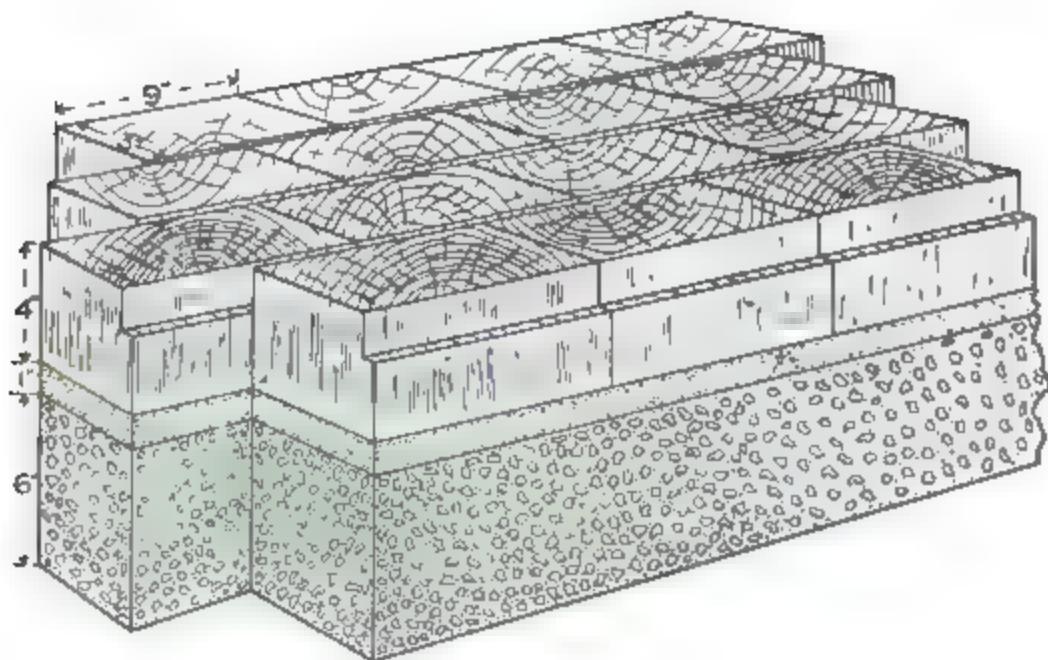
RECTANGULAR WOOD BLOCK PAVEMENT WITH WIDE JOINTS.
